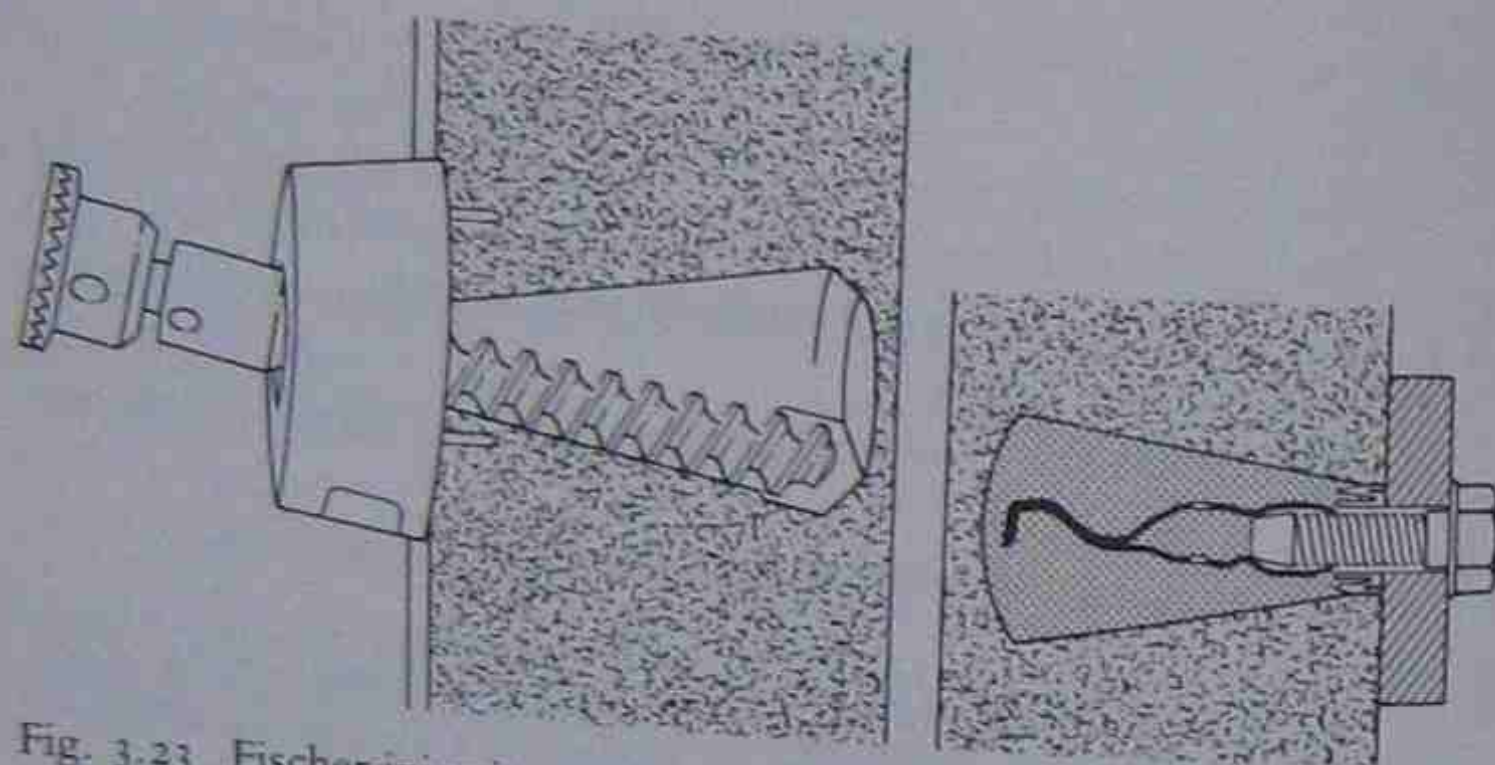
Fischer injection anchor, drilling the hole and finished fixing
